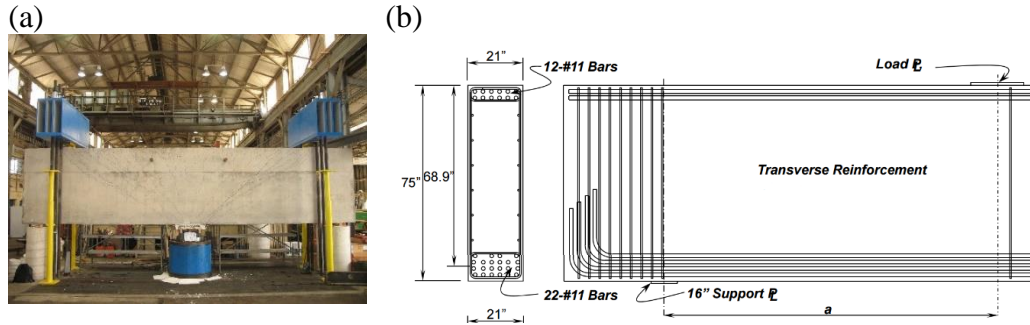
(a) Experimental test set-up, (b) general specimen section and layout, TxDOT Project 0-5253 (Birrcher et al., 2009)
